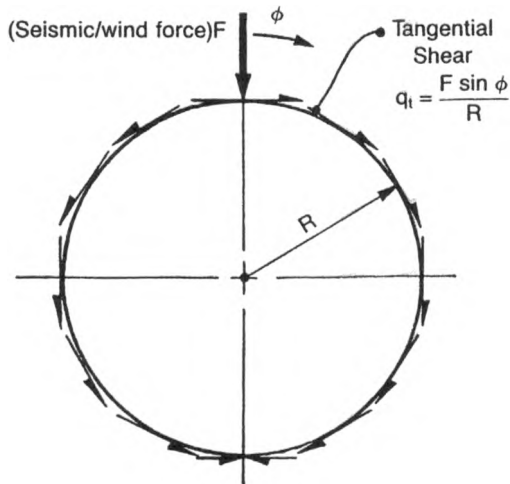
Loading diagram for a ring girder: shell to beam.
